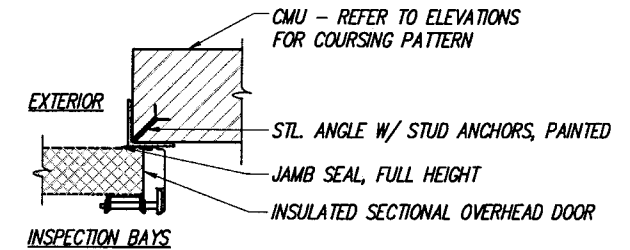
DETAIL - EXTERIOR DOOR HEAD (INSPECTION)
